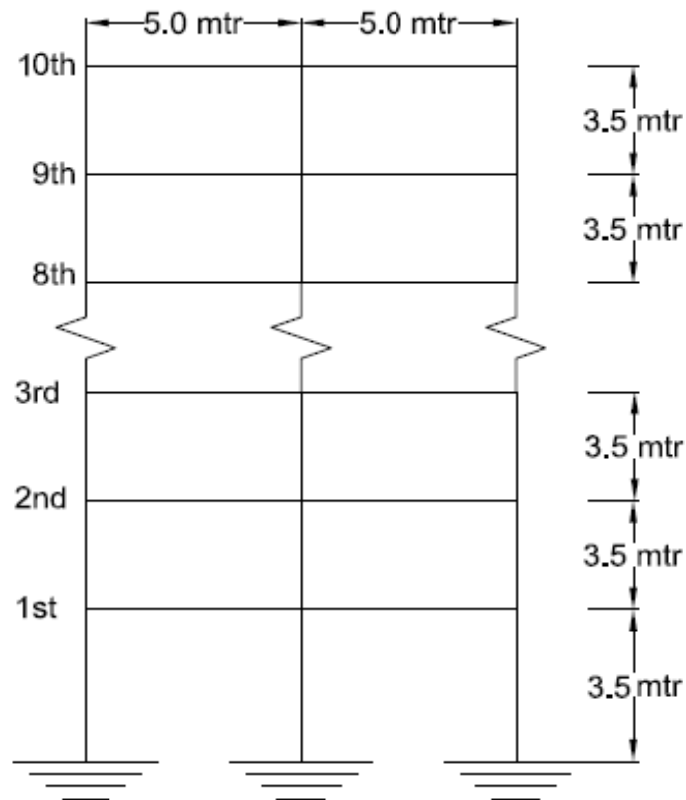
(a) Elevation of 2D Plane frame structure.
